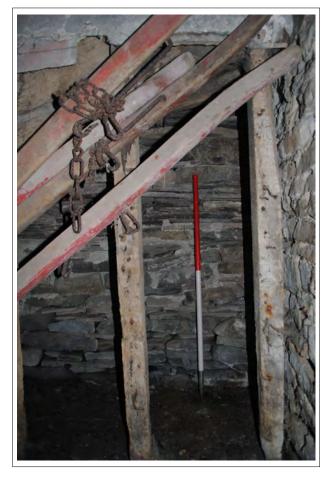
Detail of the stone wall supporting a staircase, viewed from the western side of Room 1.
